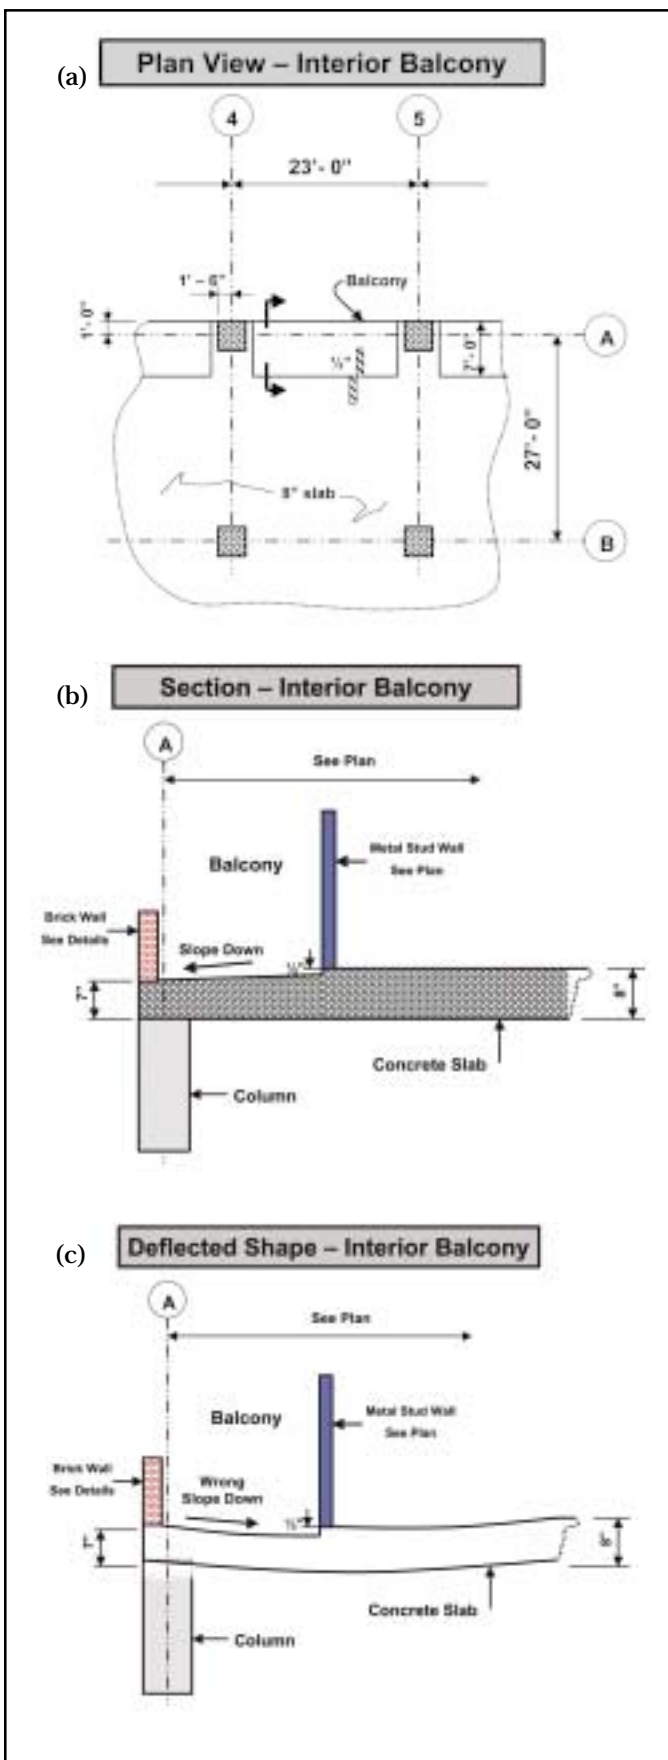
The surfaces of reinforced concrete balconies set inside perimeter columns (a) are designed to slope such that rainwater drains away from the living area (b). But after the slab deflects, rainwater often drains toward the living area (c)
